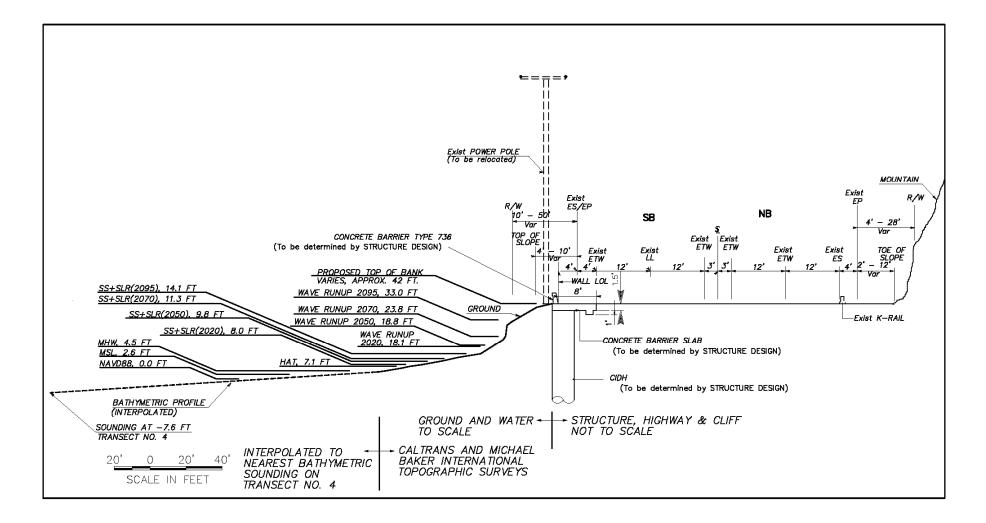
Cross section view of the proposed secant wall and applicable water levels at transect T-4 (PM 4.2).
